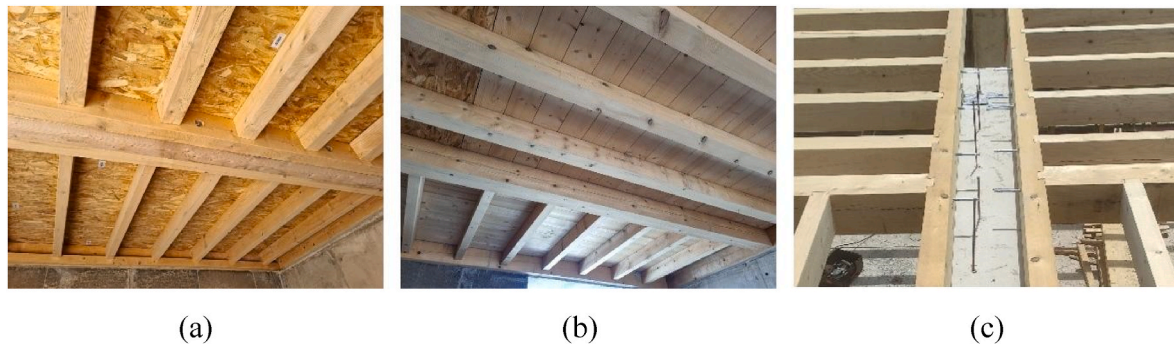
Timber slabs: (a) oriented strand board (OSB) and joists; (b) good-looking interlocked thin boards and joists; (c) connection between a plum concrete wall and timber slabs before casting of the beam.
